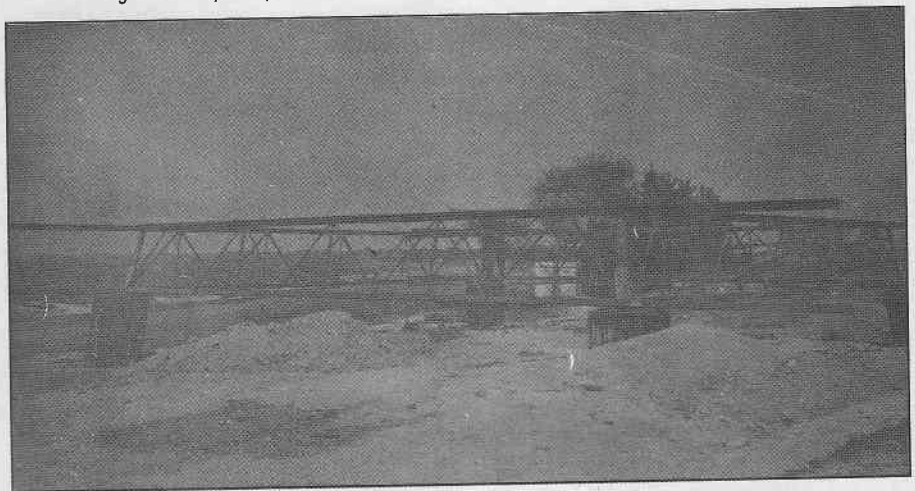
Four Pedestals Being Cast Over Pile Caps Prior To Setting Up Of Tower Stub.
